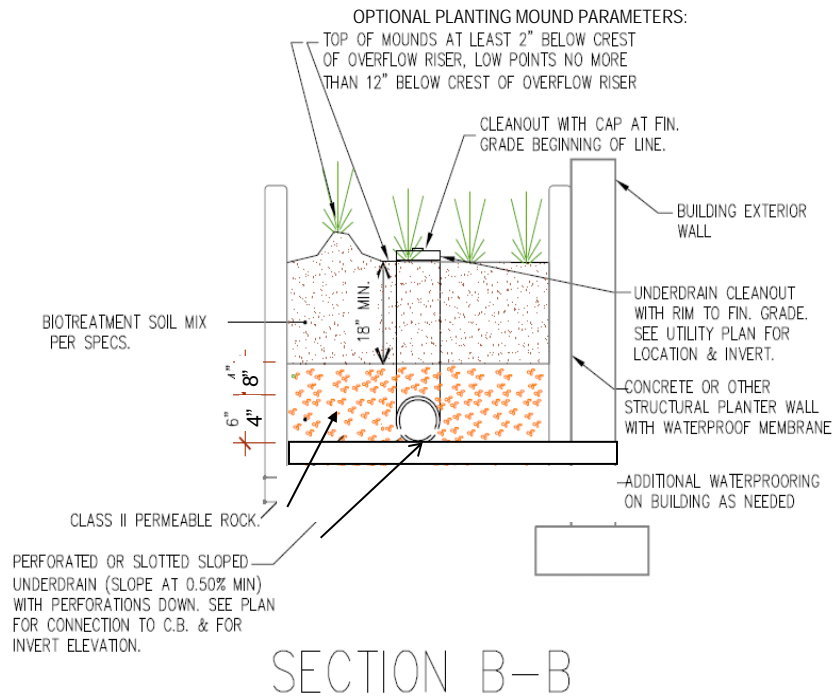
Cross section B-B of flow-through planter, shows cross section of underdrain
